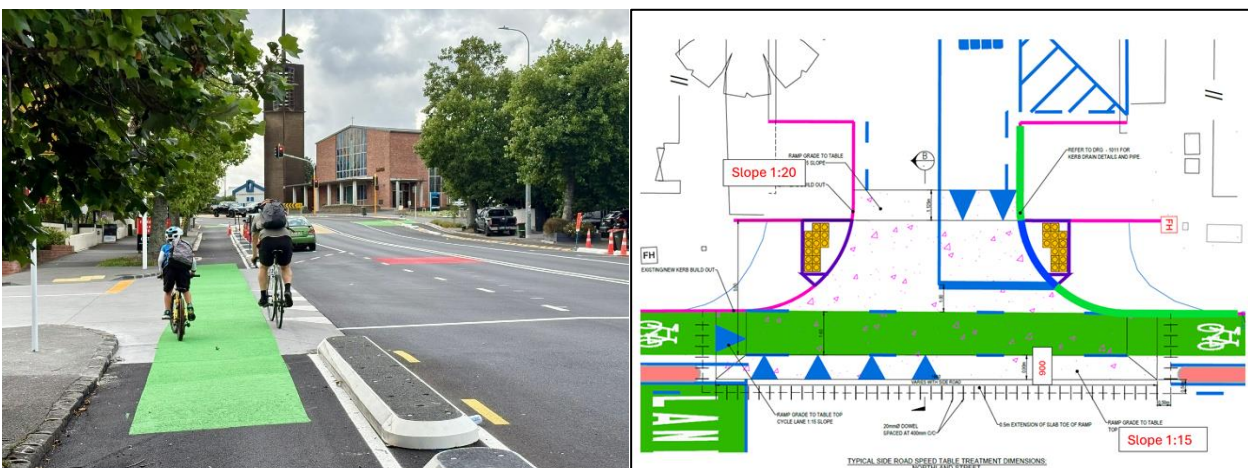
Great North Road side road RSP 1 (Photo: Jolisa Gracewood, 2026)
